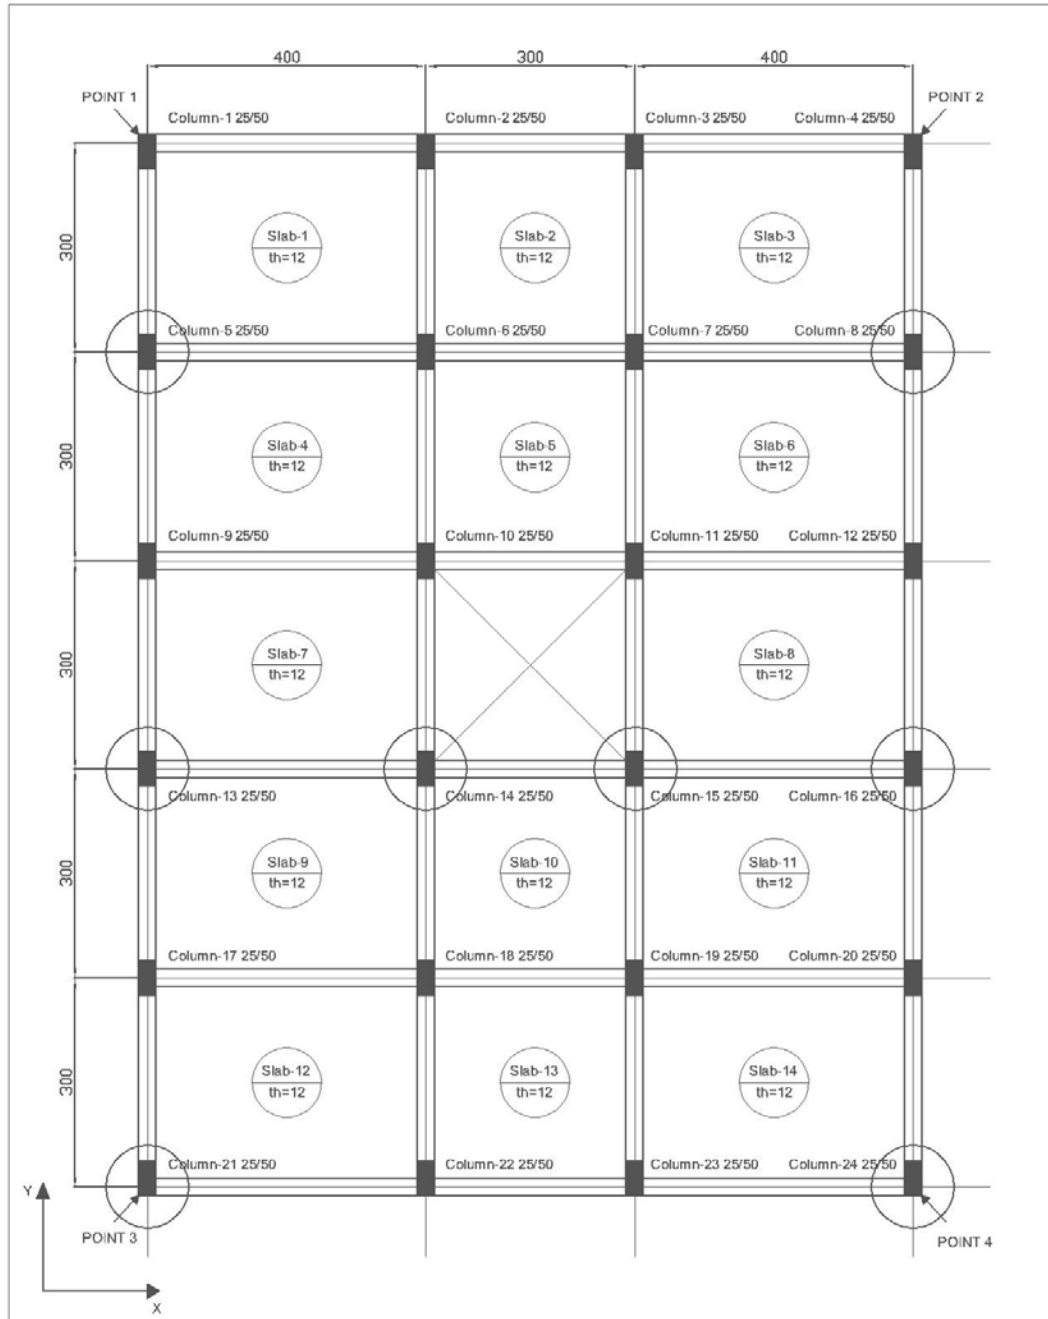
Structural Plan of Idealized Parametric Model-A
